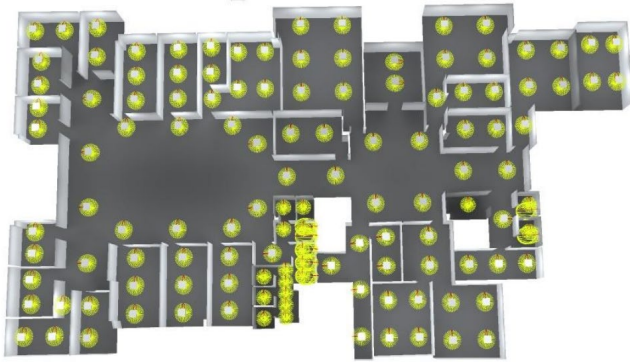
3D rendering of the ground floor lighting system arrangement.
